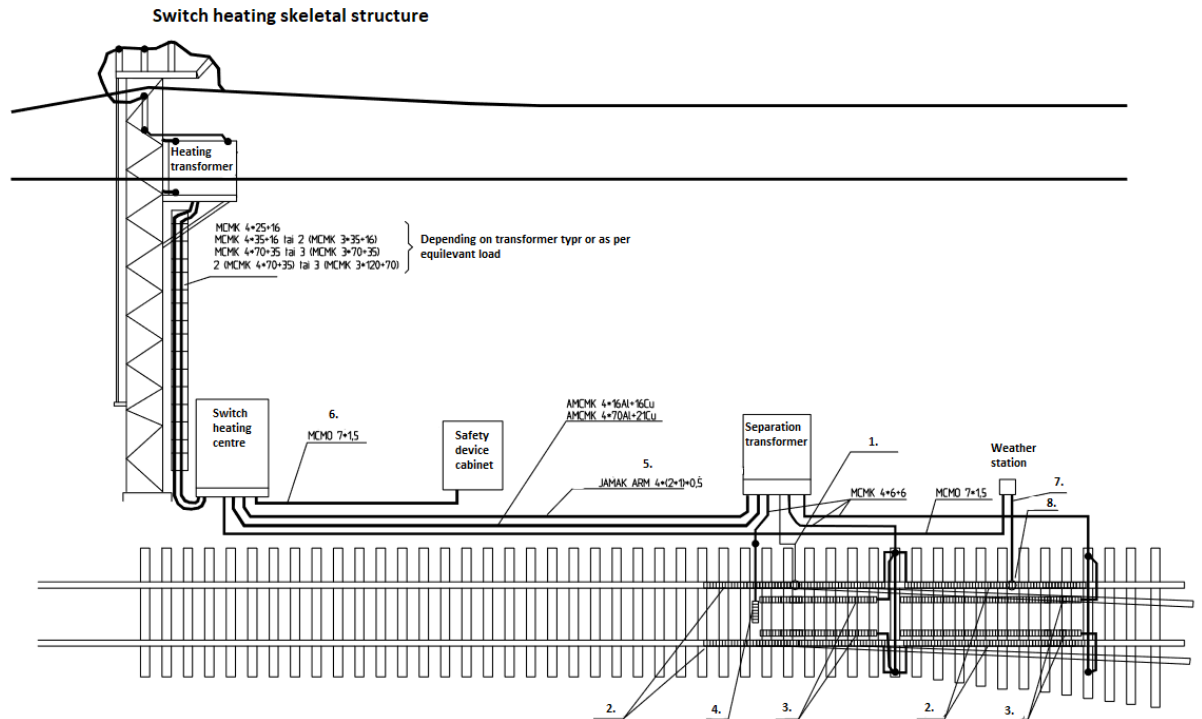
Skeletal structure of switch heating including main components. More information coming in the following paragraphs. 1. Rail temperature sensor installed to rails lower surface, 2. Support rails resistor, 3. String resistor, 4. Bar pits resistor, 5. False alarm / armed cable, 6. Control and indicator cable, 7. The special cable coming with sensor delivery, 8. Weather station rail temperature sensor. [4,91.]
